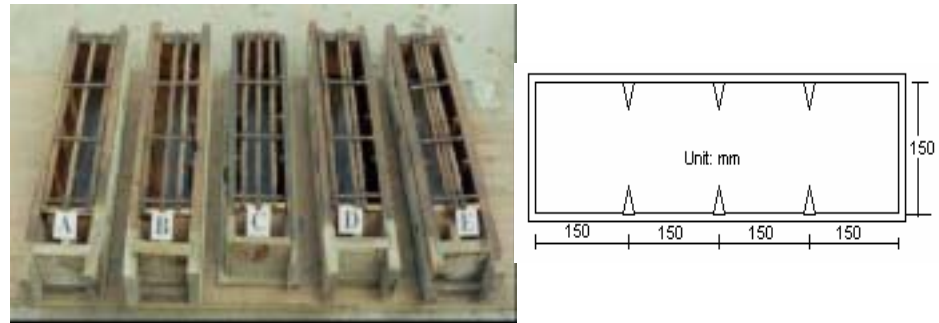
Formwork for prisms with bars on top and wedges on the sides
